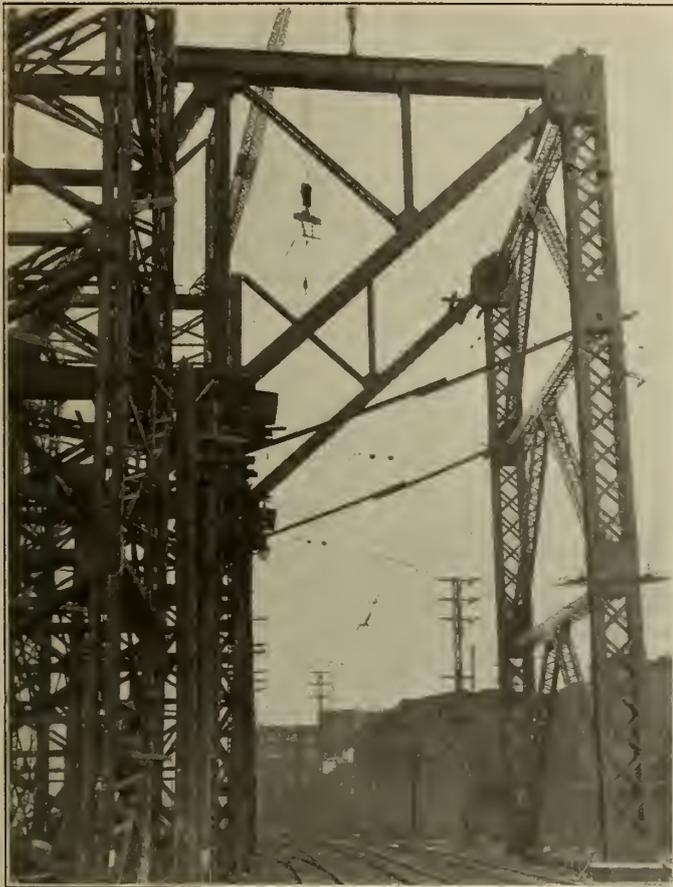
Main Span, North Side—Arrangement of Falsework Tower.
